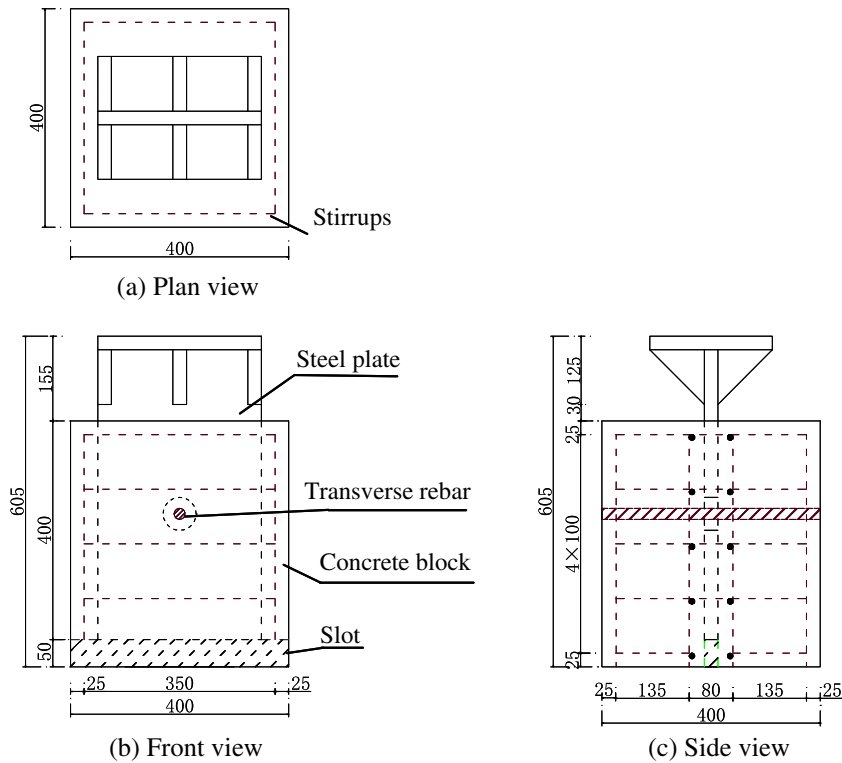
Geometry of the tested specimens (R-b1r1d1 example, dimensions in mm).
